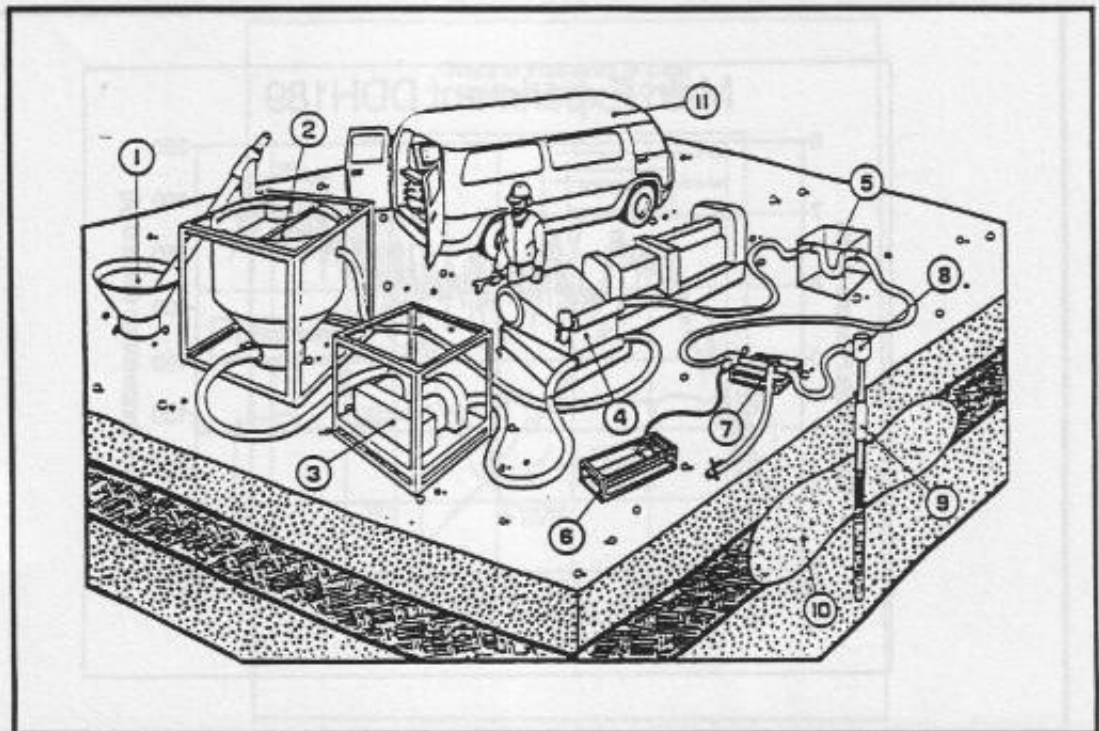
Scale-scale hydraulic fracturing equipment. 1-sand auger, 2-blender, 3-centrifugal pumps, 4-triplex pump, 5-flow and density meter, 6-activator pump, 7-shut-in and flow back valves, 8-well head, 9-packer and pressure sensor, 10-hydraulic fracture, 11-instrumentation van
